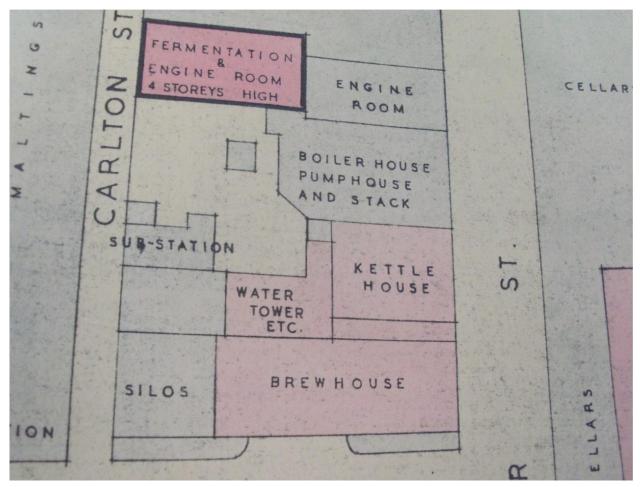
Section of block plan showing Irving Street Brewery Buildings by Lemont Niblett and Daubney, Drawing No. 798, MA9691 dated 31-03-55
